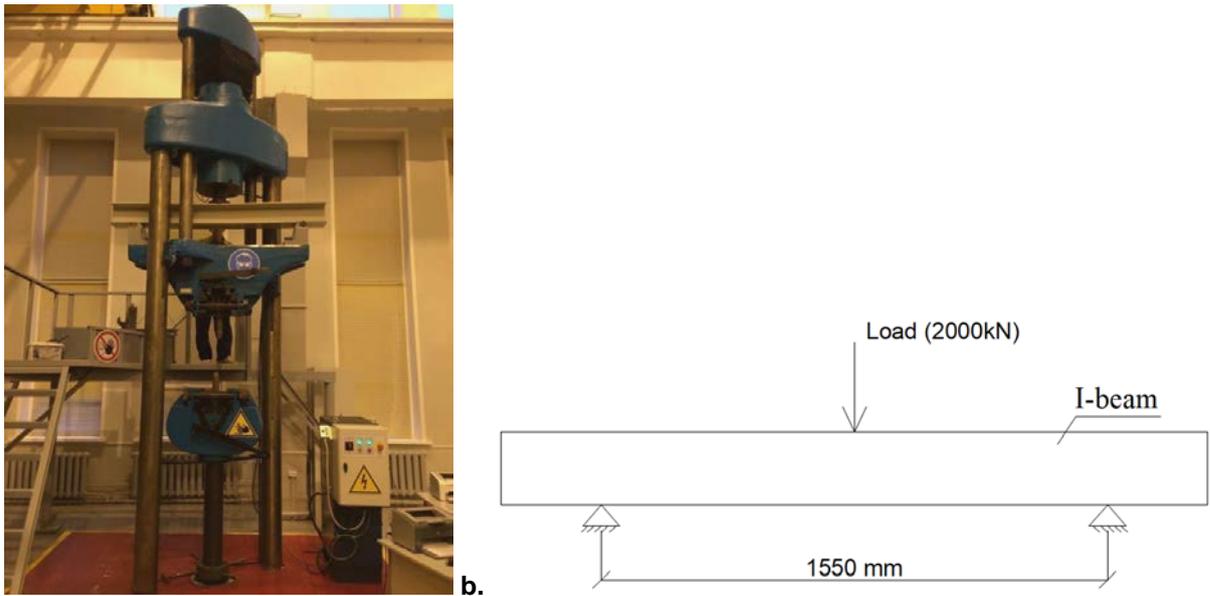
Flexural bending test of I-beam from PFRP: a –hydraulic press; b – scheme of a loading.
